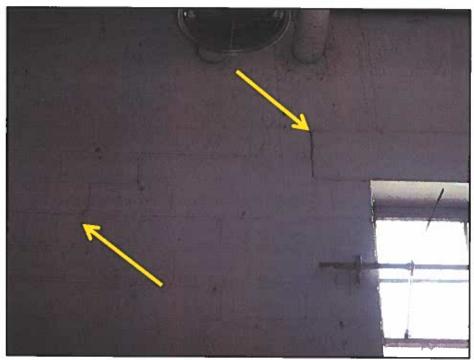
Cracks in the gym walls near the clerestory. Front left side
